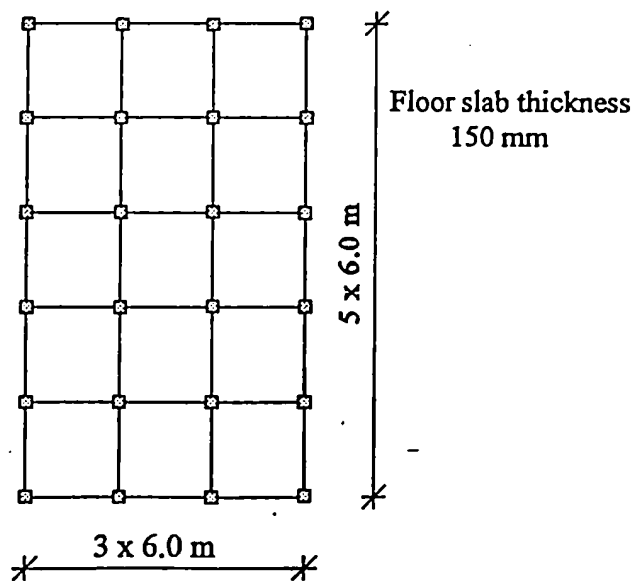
Typical floor plan of the building (Biddah, 1997)
